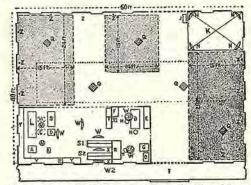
Floor plan of the garage, showing location of departments, skylight, and arrangement of tools and lamps.
